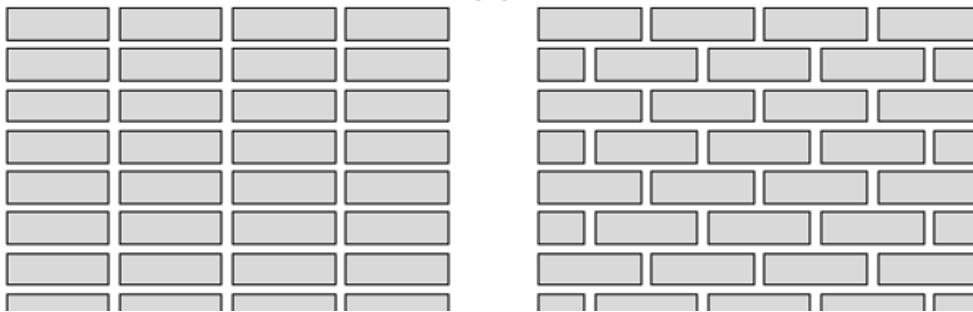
Pattern of masonry wall (a) stack bond; (b) stretcher bond. [120]
